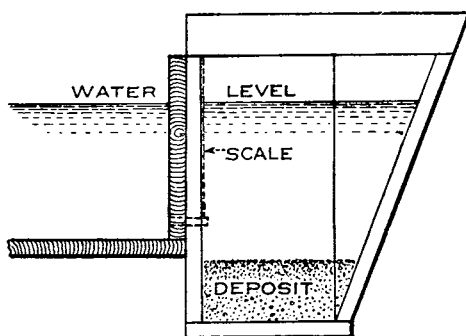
Suggested Construction of Open Stilling-well with Staff Gage or Scale Inside the Well.
